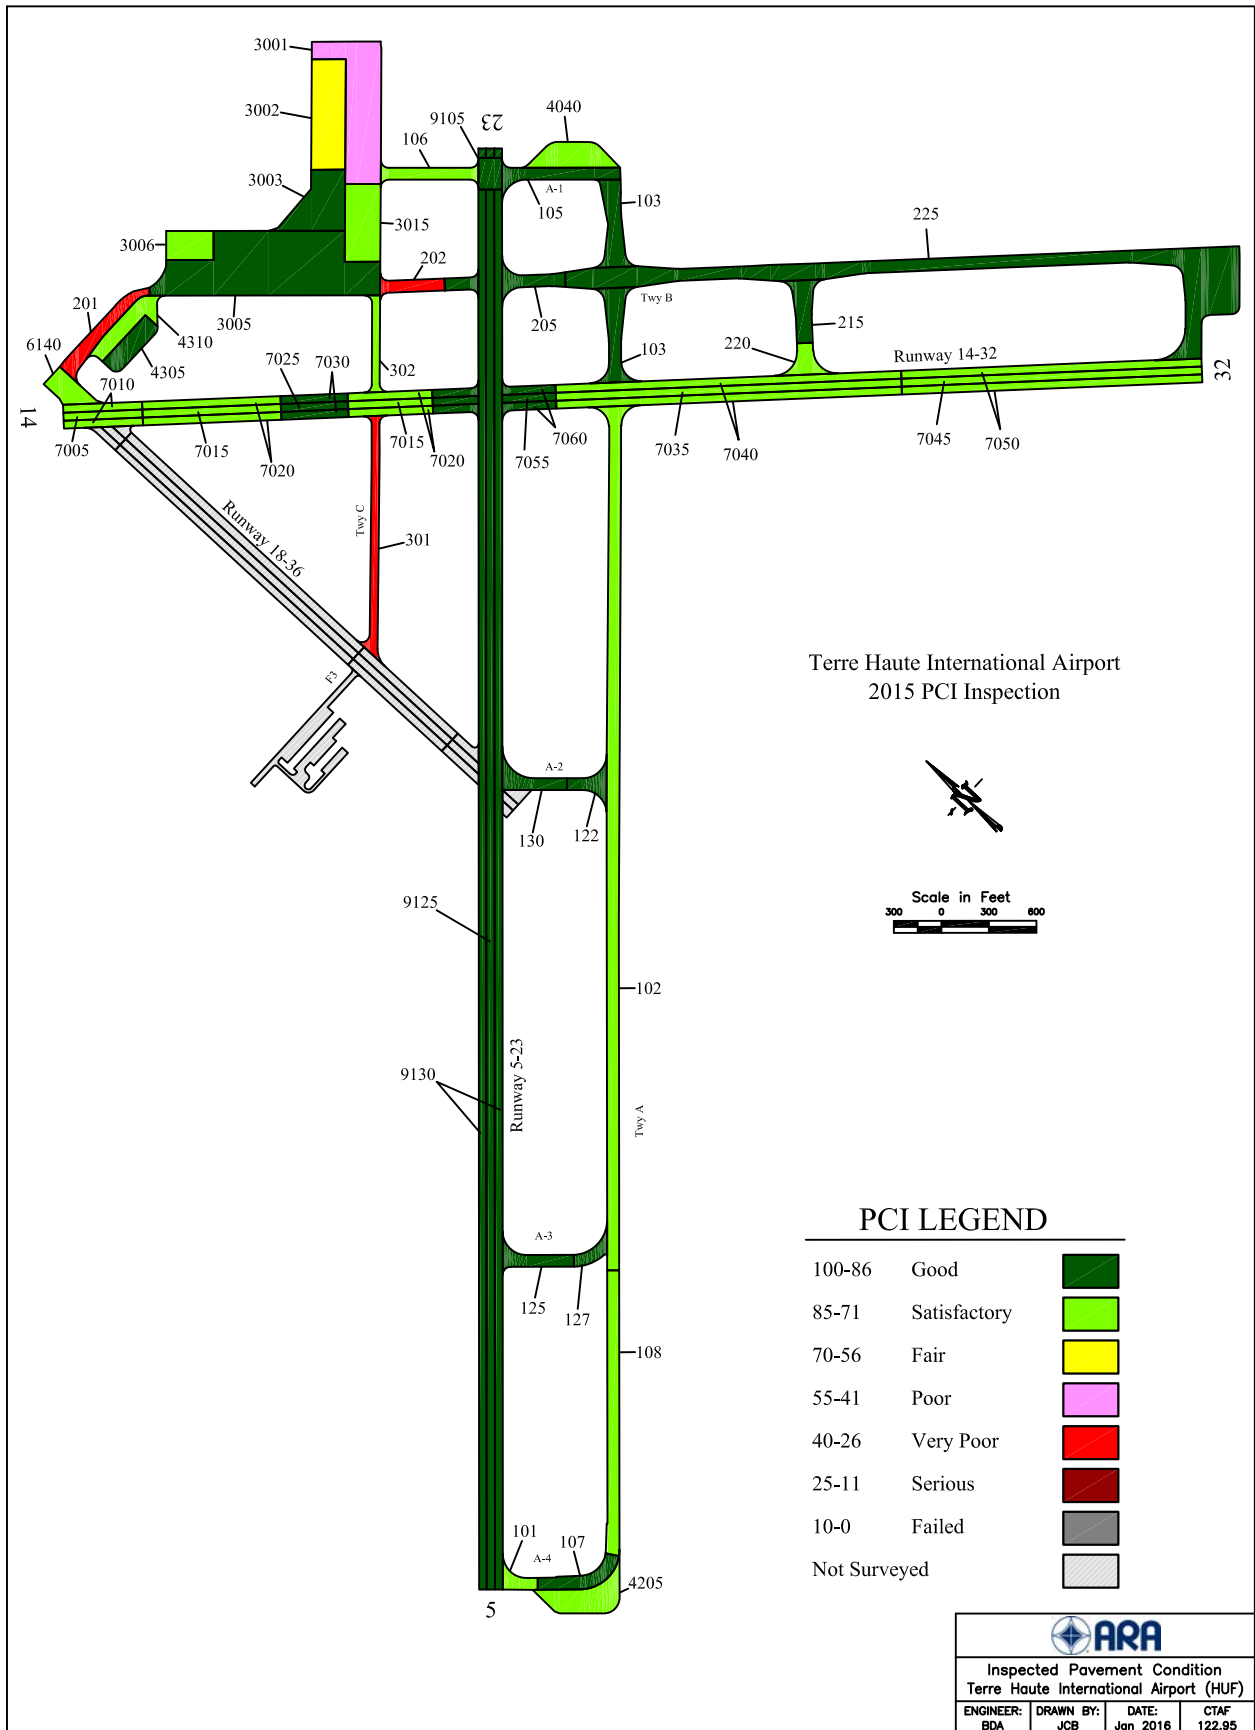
Inspected Pavement Condition at Terre Haute International Airport (HUF).
